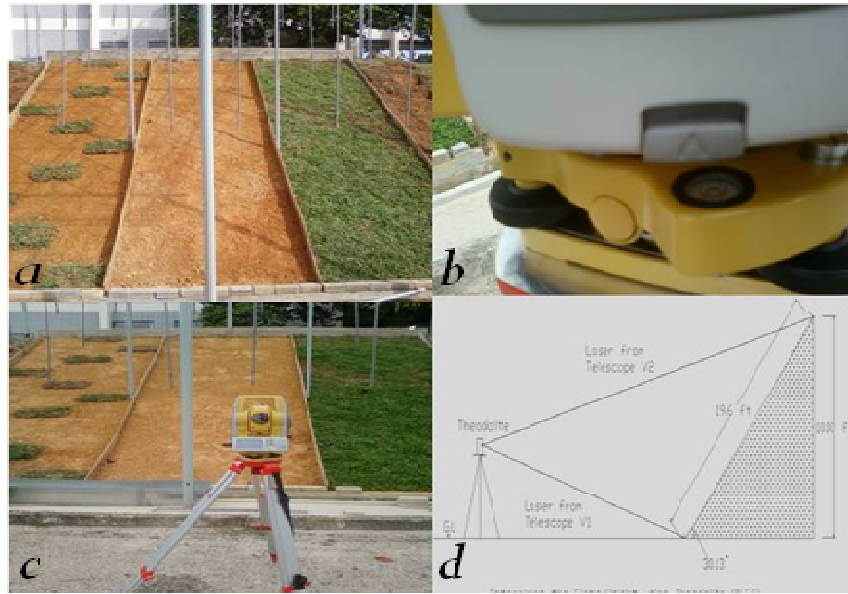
The existing site location and slope determination, (a) front view, (b) theodolite, (c) determining the slope angle and (d) side elevation (autocad drawing)
